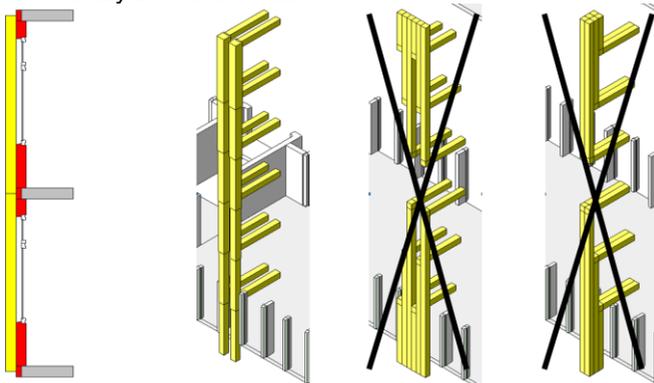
LEFT: FAÇADE INTERSECTION WITH ADDITIONALLY MOUNTED MODULES, RIGHT: DISCUSSED VENTILATION DUCTWORK INSIDE THE FAÇADE ELEMENTS
